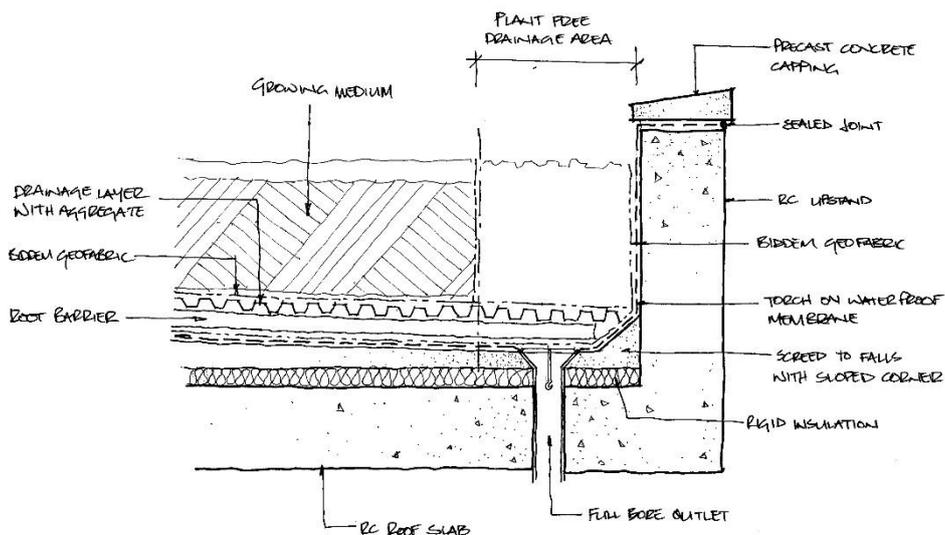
Sketch detail of flat roof garden layer works (Source: Author).
